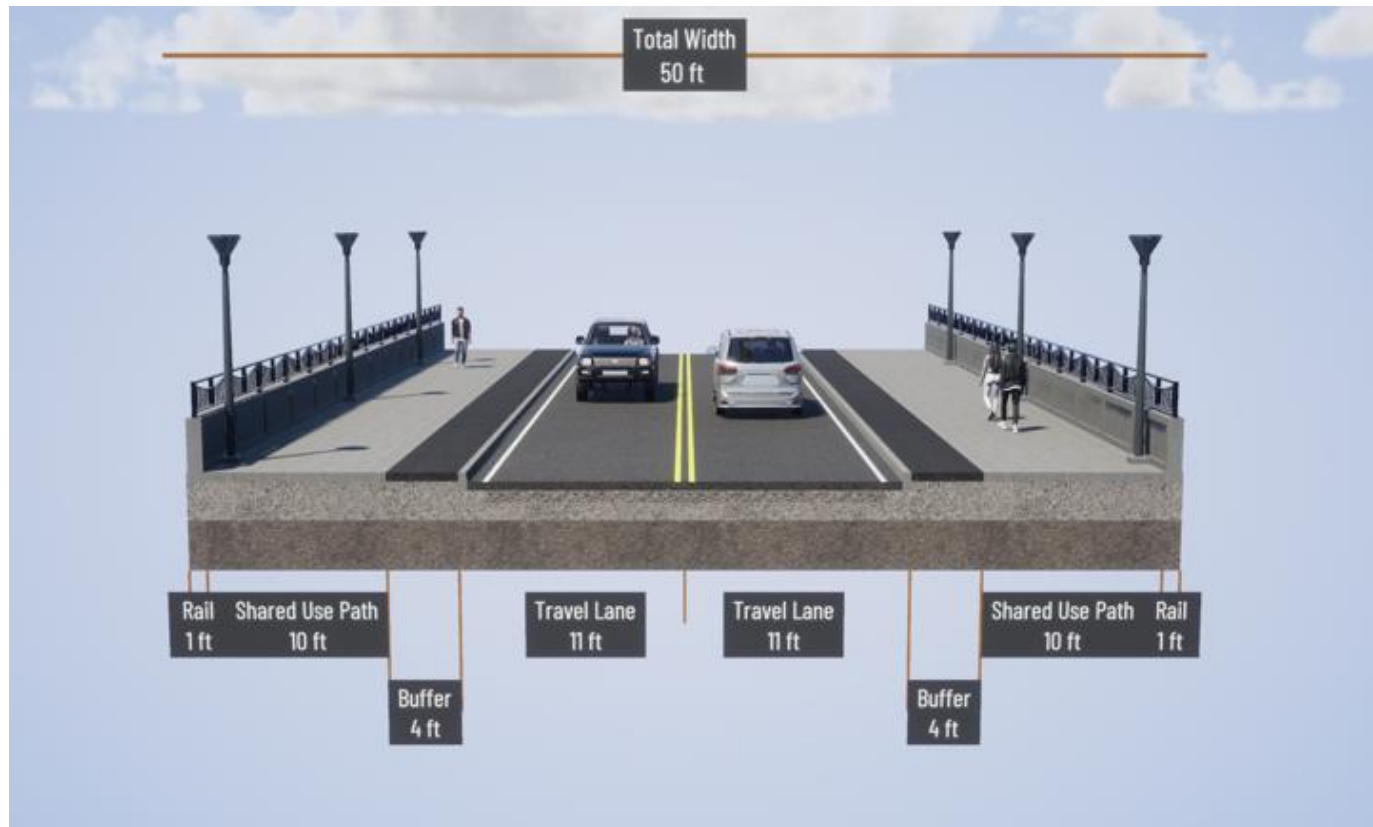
Canal Vehicular Bridge – 50' ROW Option 2 (Shared or Local Street)
